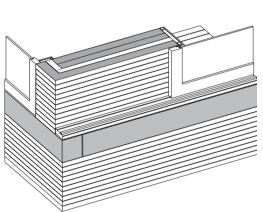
Axonometric view of sliding window Wall behind sliding window built as twin-leaf masonry, otherwise combination masonry
